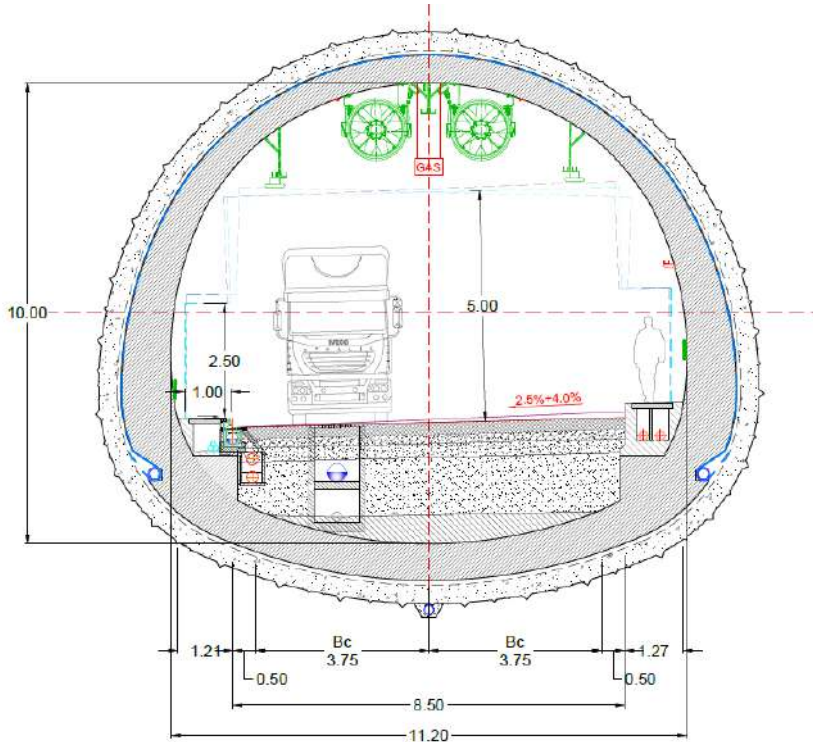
Cross-section of the Moimesti Tunnel Tube 1 with internal dimensions in meters.
